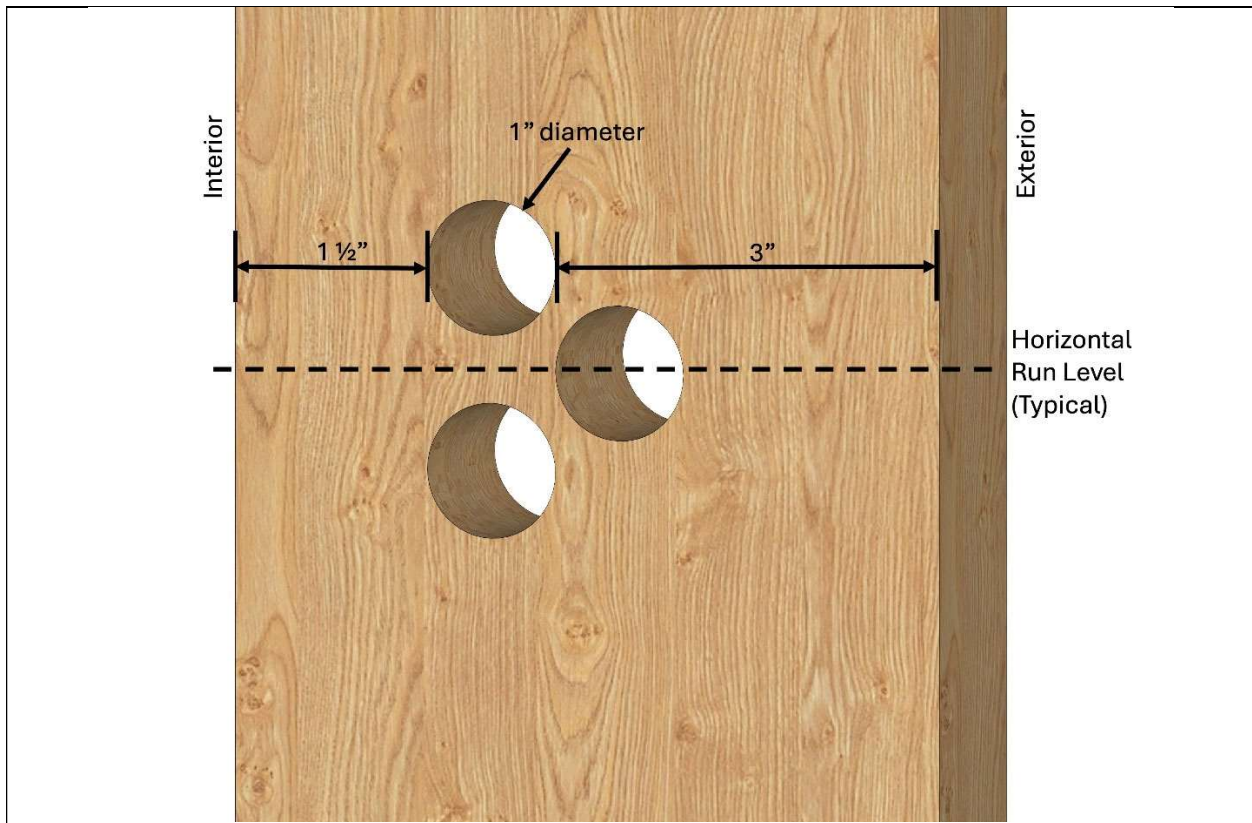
Test Fixture Stud Section Hole Drill Pattern
